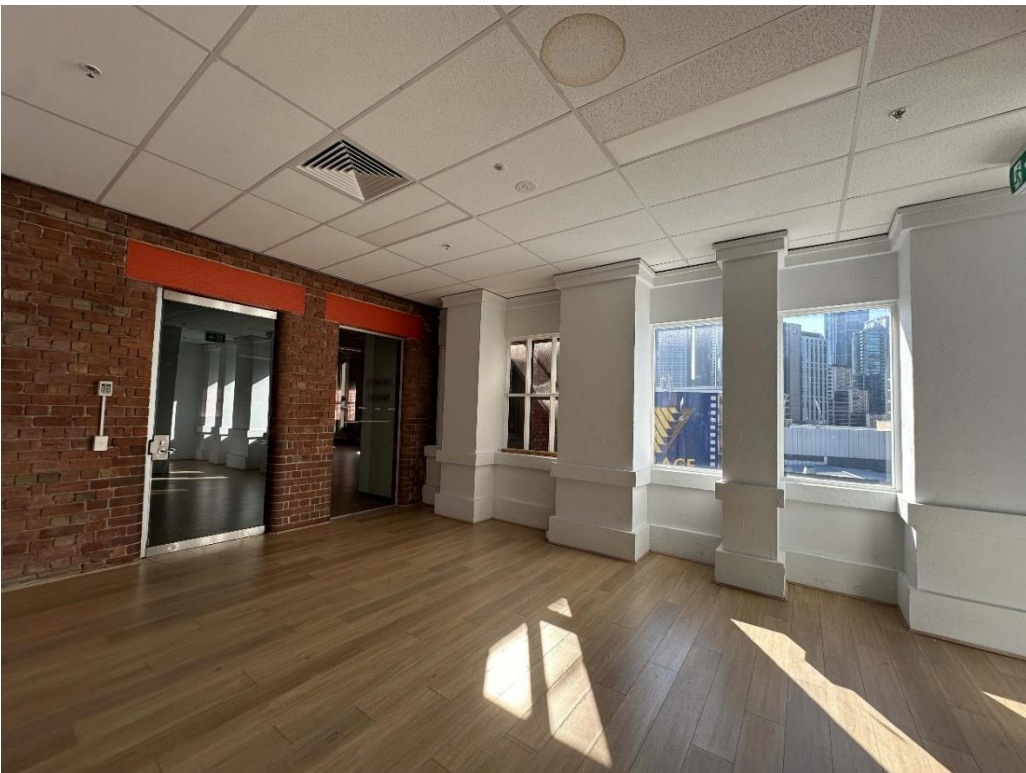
Modified windows in the south elevation of the Tea House to provide access into the building from the lift core
